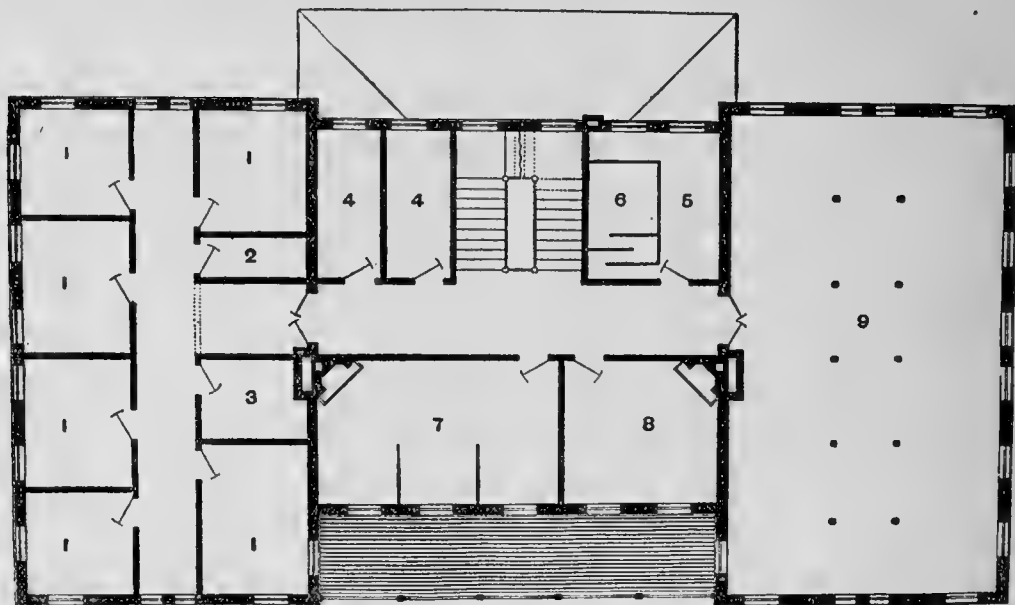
Plan of second floor of laboratory building. 1, Six bed chambers; 2, linen closet; 3, janitor's closet; 4, two bathrooms; 5, photographic room; 6, dark room; 7, north laboratory; 8, director's laboratory; 9, west wing.
